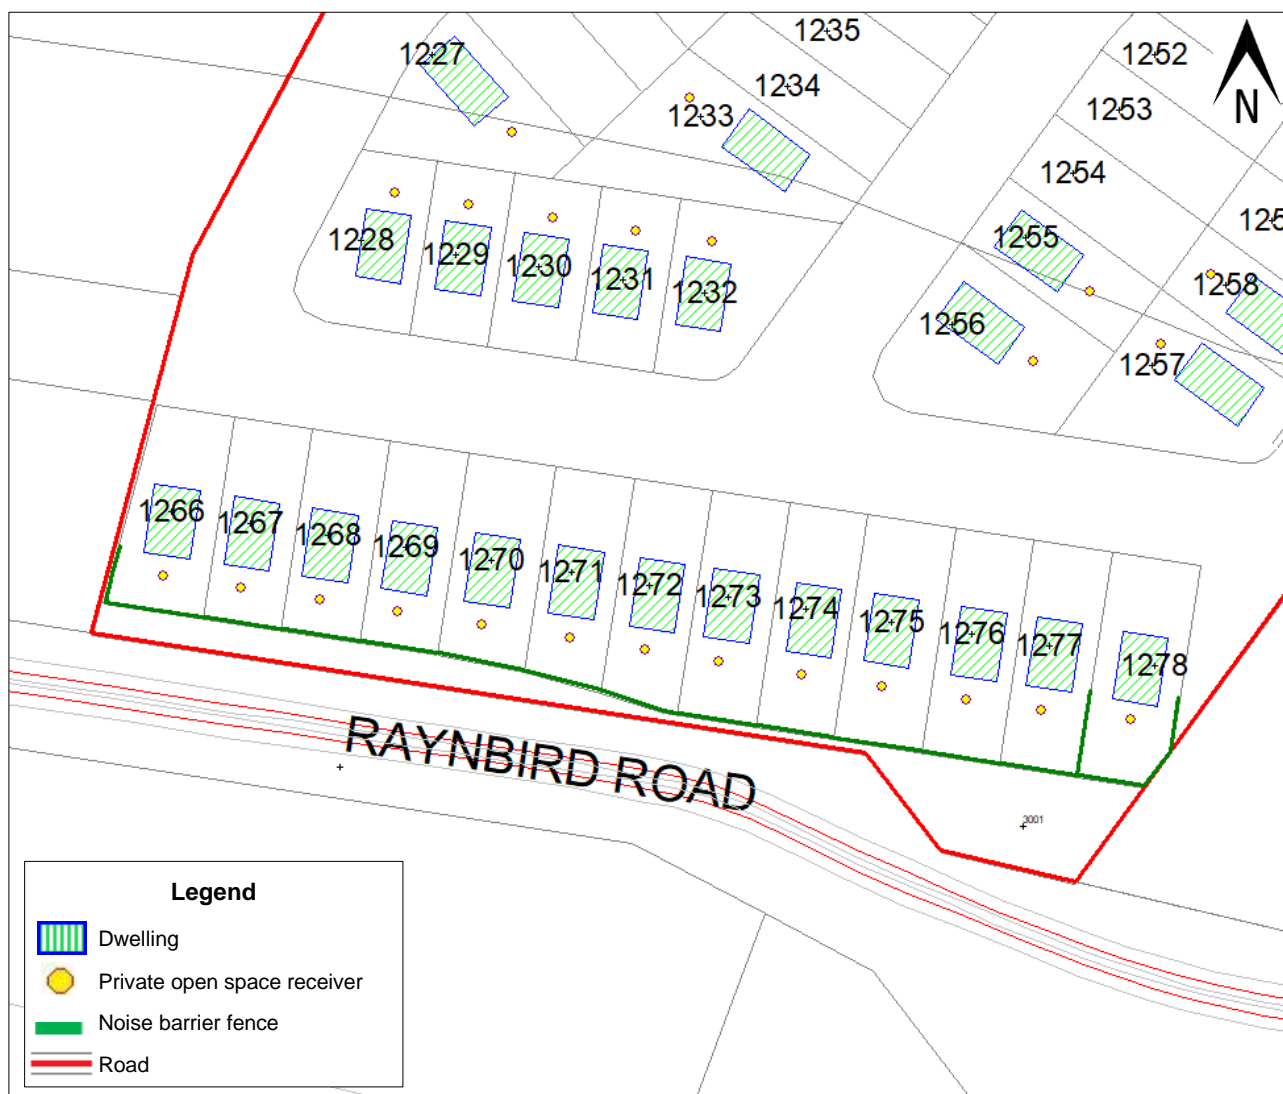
SoundPLAN Traffic Noise Model – Detail 1
